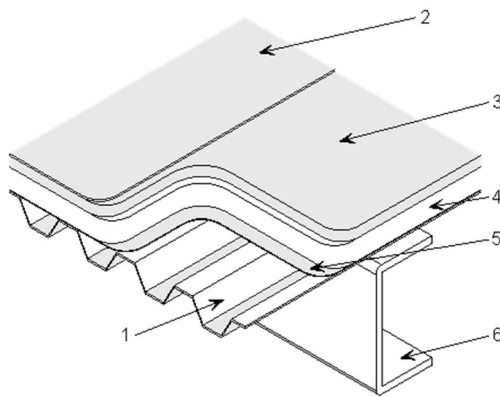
Structural liner tray system; Source: [steelconstruction.info](http://steelconstruction.info)
